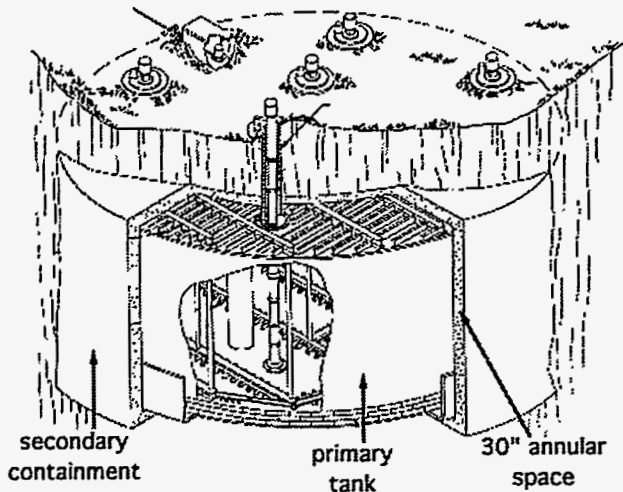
Underground Storage Tank for High Level Waste. Dimensions are similar to above ground Petroleum Storage Tanks.
